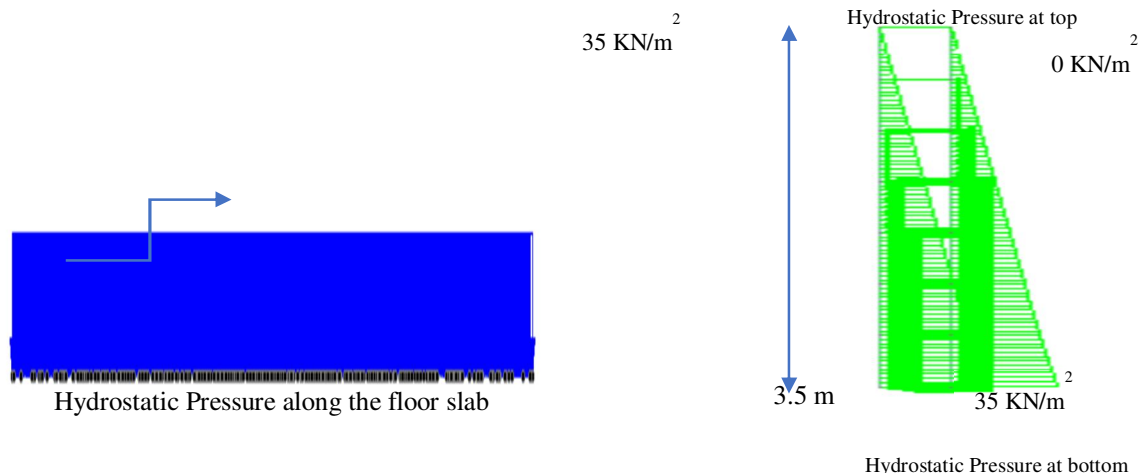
Hydrostatic Pressure on tank walls and floor slab under tank full condition
